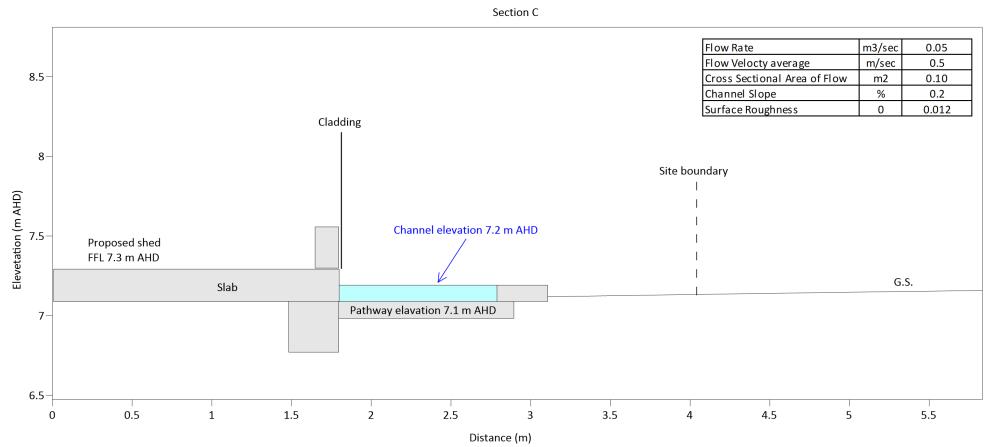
AEP Site Stormwater Flow Analysis - Cross Section C Within the Building Envelope - Drawings Are to Scale and For Conceptual Modelling Purposes Only
